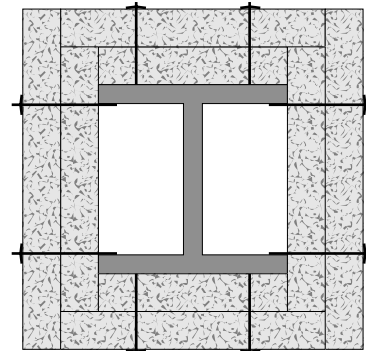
BRADFORD FIRE PROTECTION FOR A TYPICAL STEEL COLUMN.
